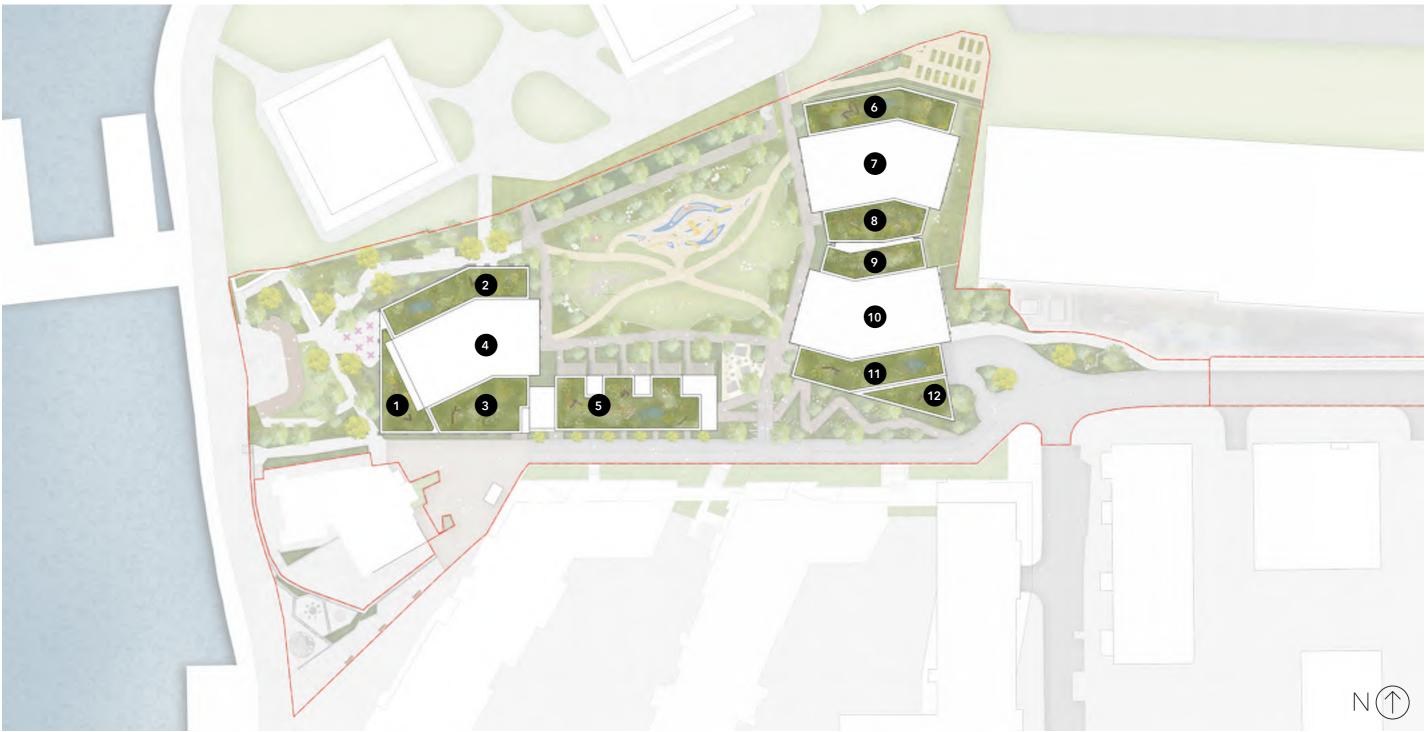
Illustrative Masterplan - Accessible Podium + Roof Level
